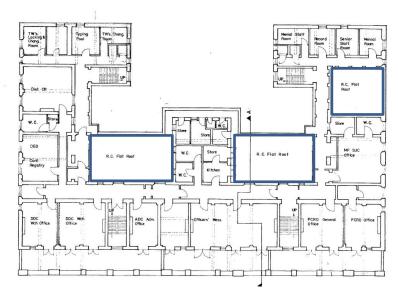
Roof terraces on 2/F plan in 1988 [ArchSD plan modified by author]
